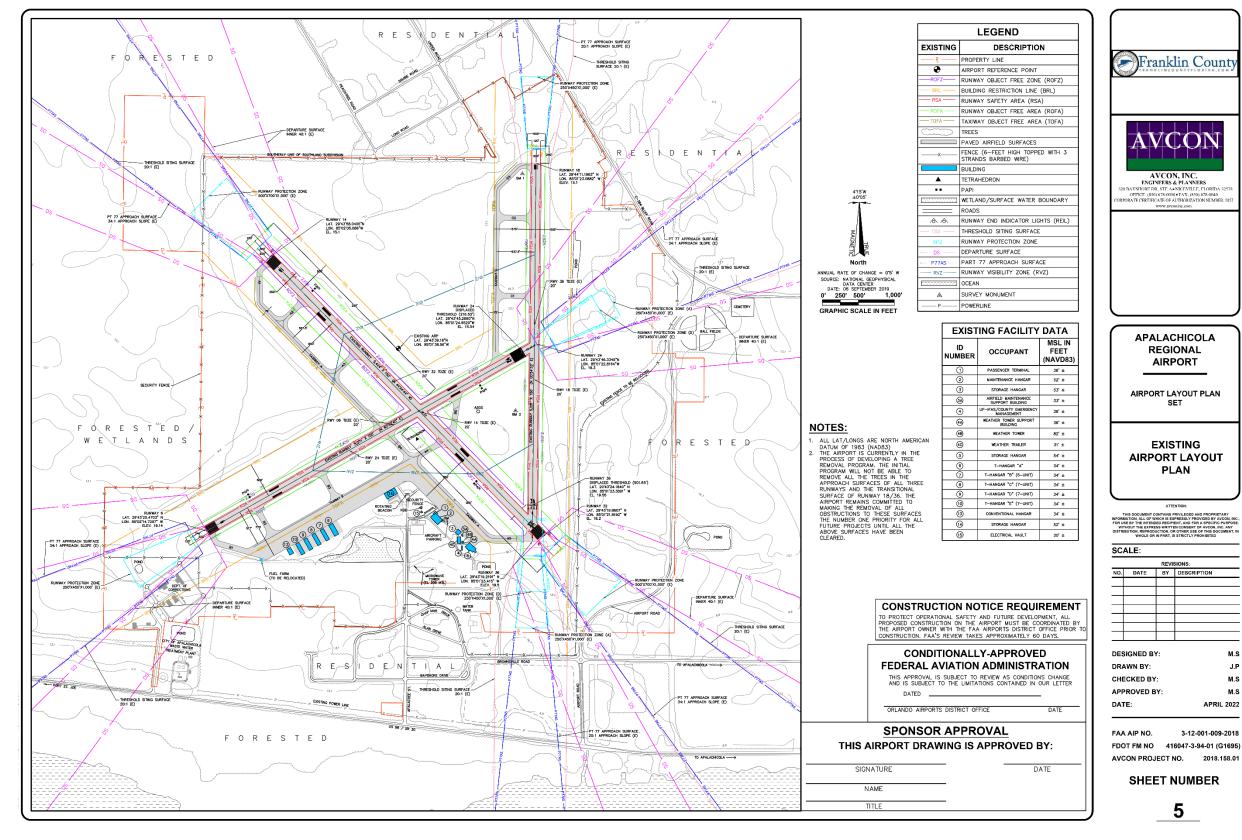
EXISTING AIRPORT LAYOUT PLAN
